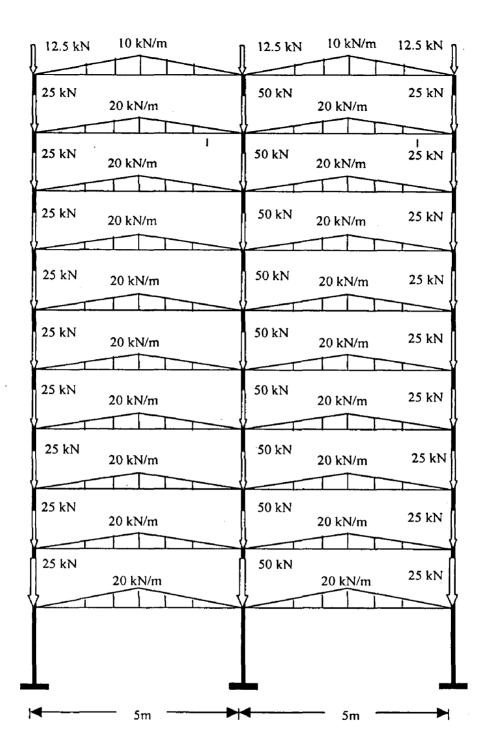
Live load details on G+10 storeyed two-bay plane frame with soft storey
